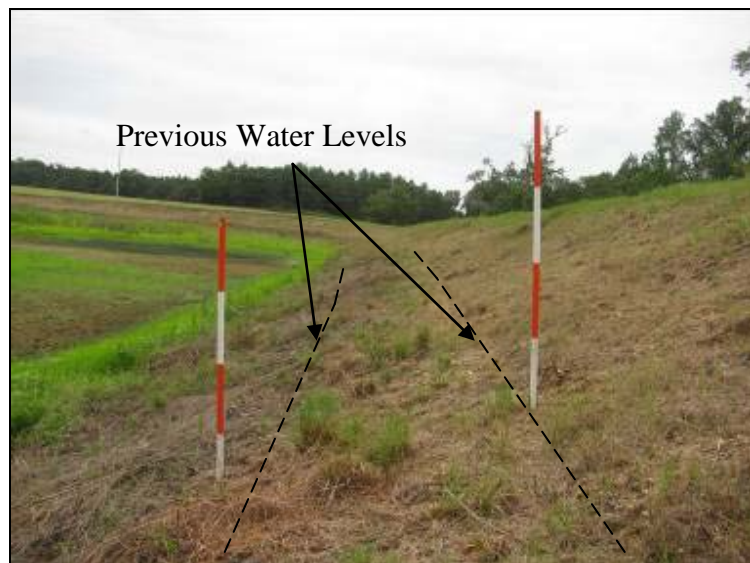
Ash Pond – West embankment interior slope, looking south. Note apparent previous water level marks.
